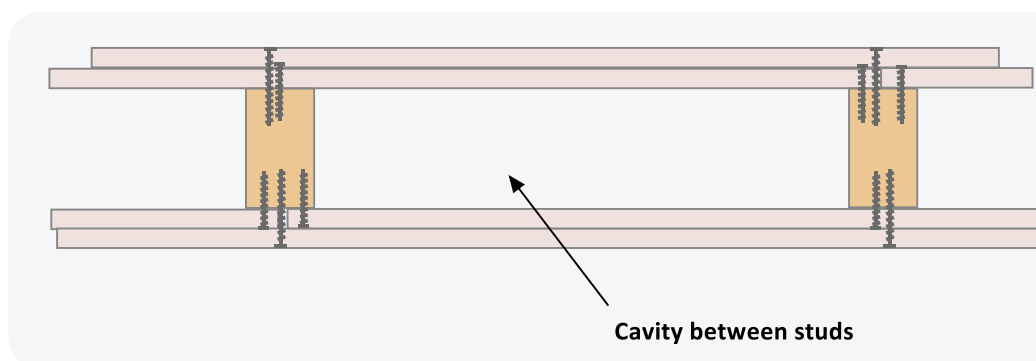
Horizontal section through typical FRL90/90/90:RISF45: NC timber stud wall.
